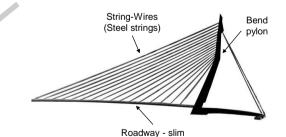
Drawing of the concept used for building the Erasmus Bridge.
